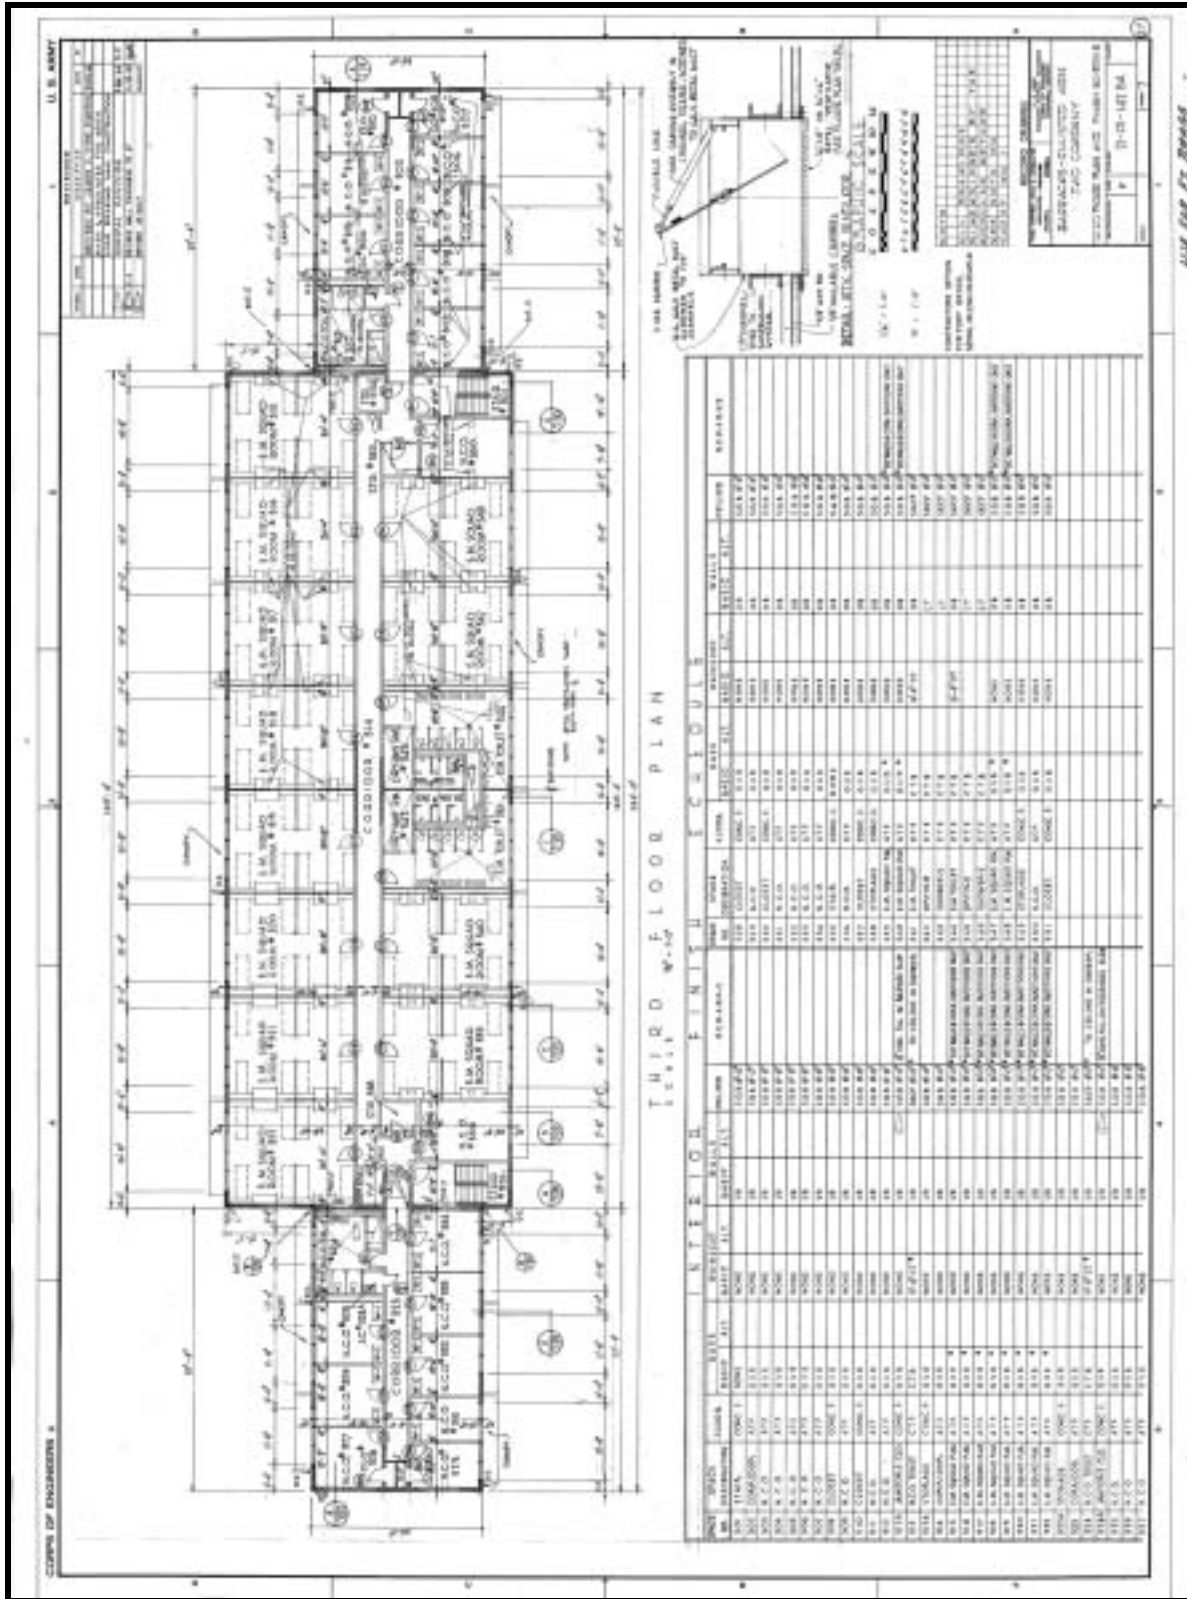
Rolling Pin, two-company barracks, third floor plan, Ft. Bragg (ca. 1959, revised 1967) (Engineering, Ft. Bragg).
